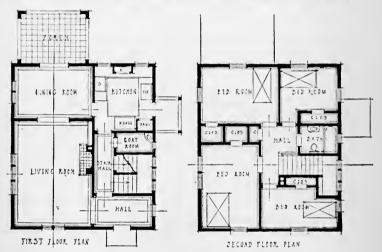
Floor plans of a small house. The first floor plan shows a desirable spaciousness of living area and adaptability of working parts. The second floor plan shows an arrangement of four bedrooms, closets, and bath developed from a central hall.
